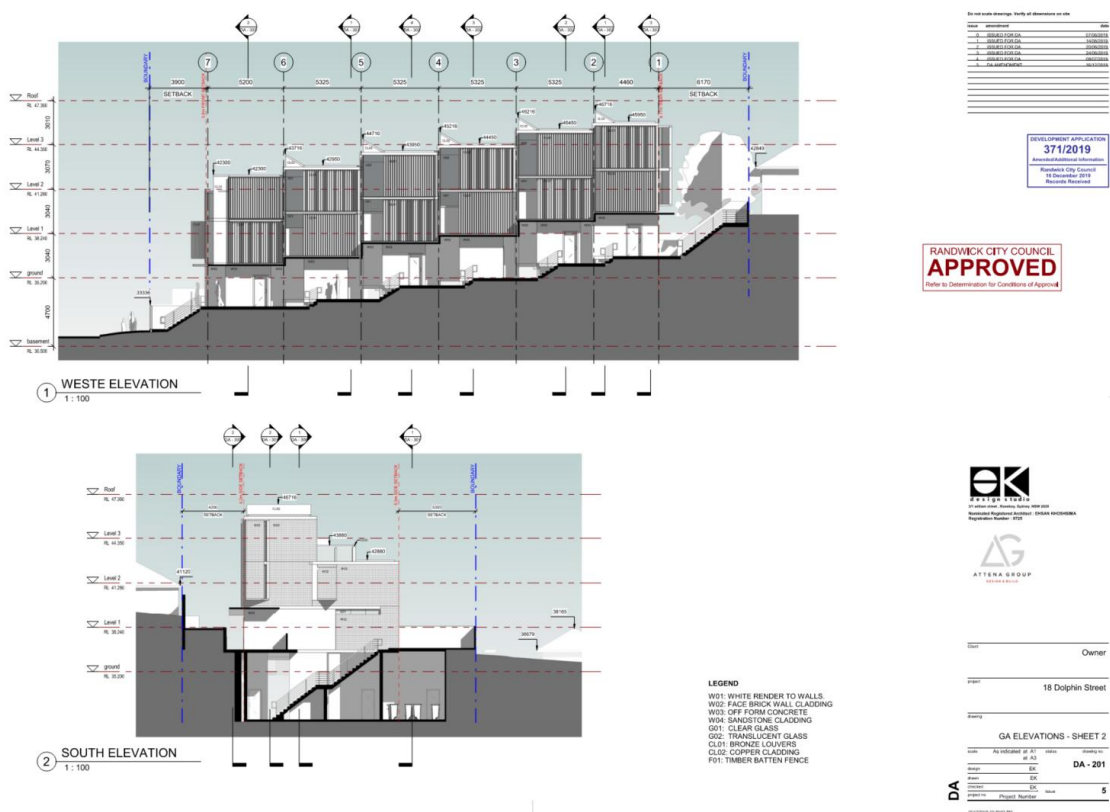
South & West Elevations approved under DA/371/2019 (Source: EK Design Studio)
